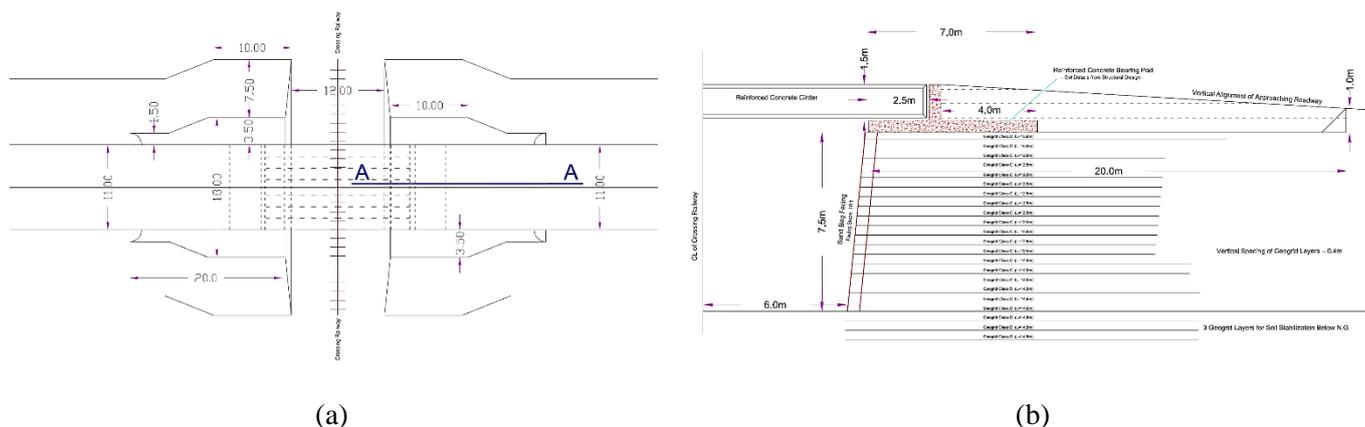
Overpass railway abutments: (a) Plan view (b) Typical section of the reinforced abutment
